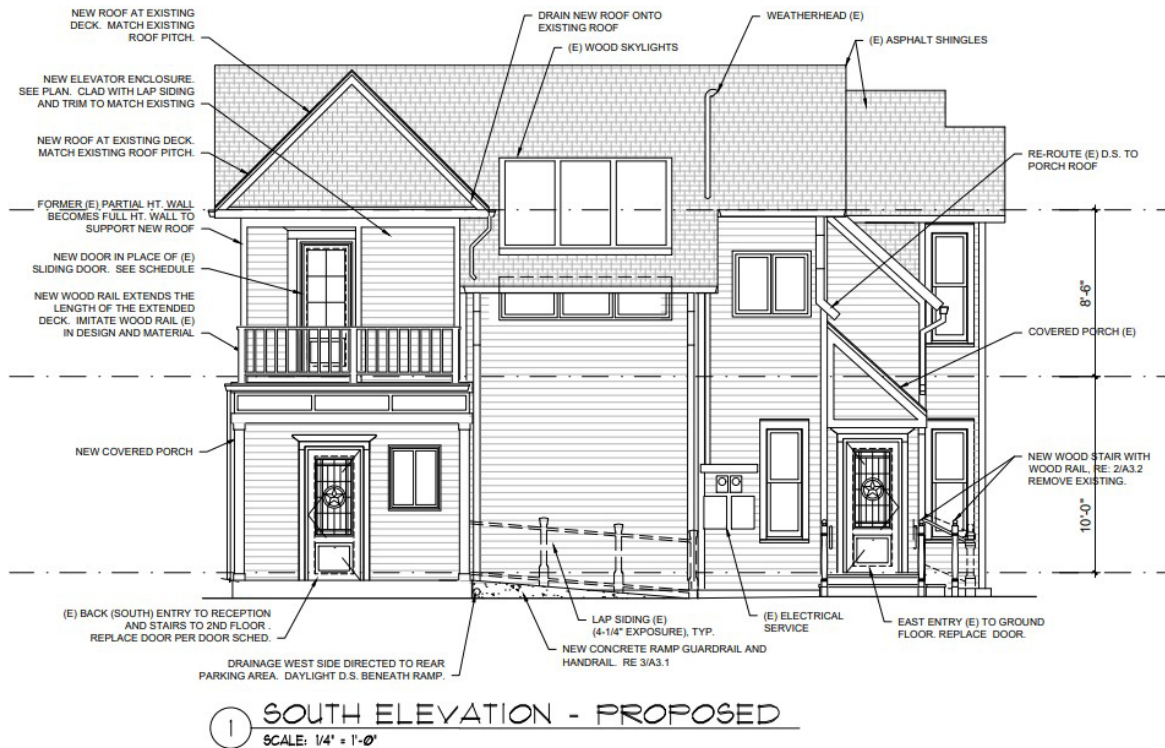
Proposed designs on south elevation highlighted, 2506 W. Alamo Ave.
